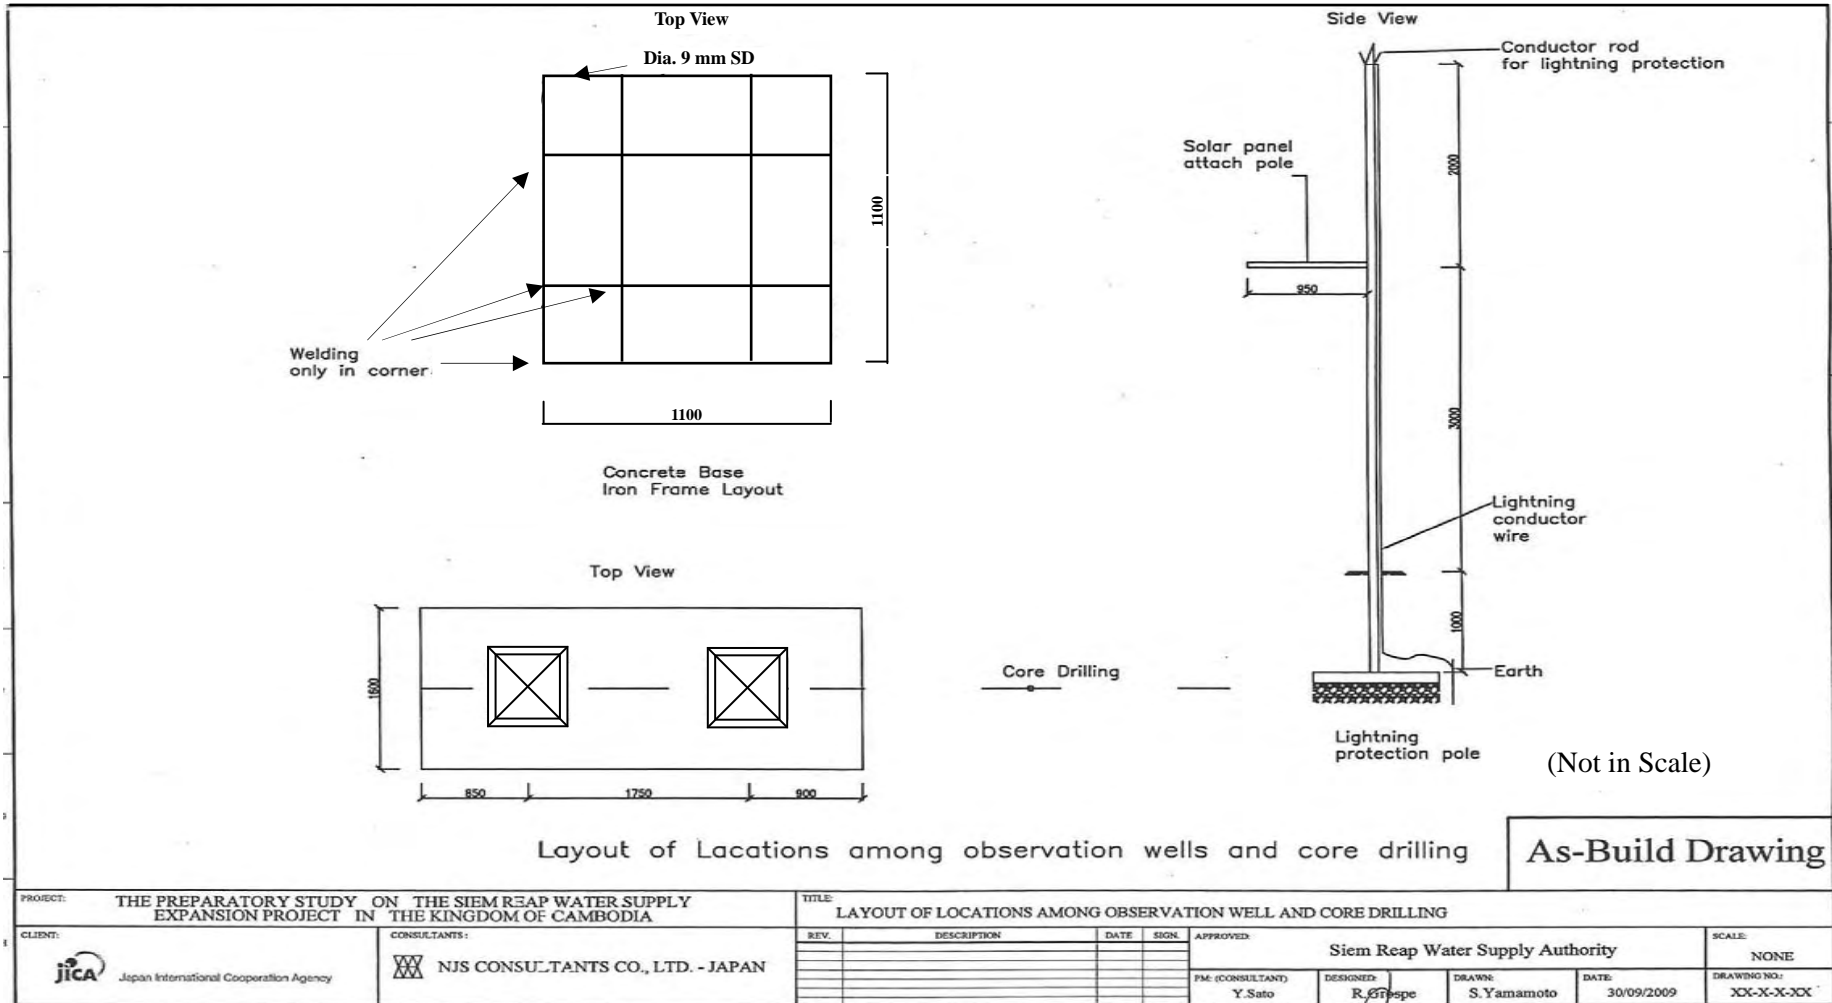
(4) As-Build Drawing of Layout of Locations among Observation Well and Core Boring
